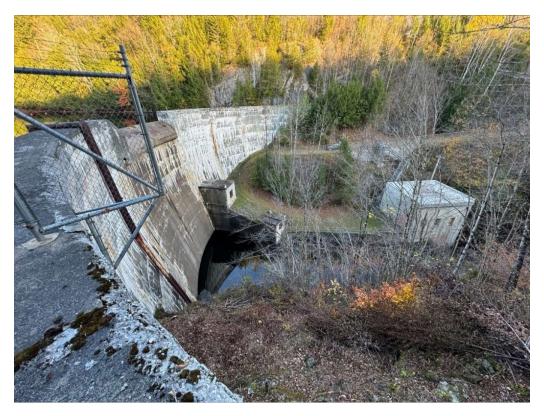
Downstream face of concrete arch dam and valve/gate buildings (9-18-2024).
